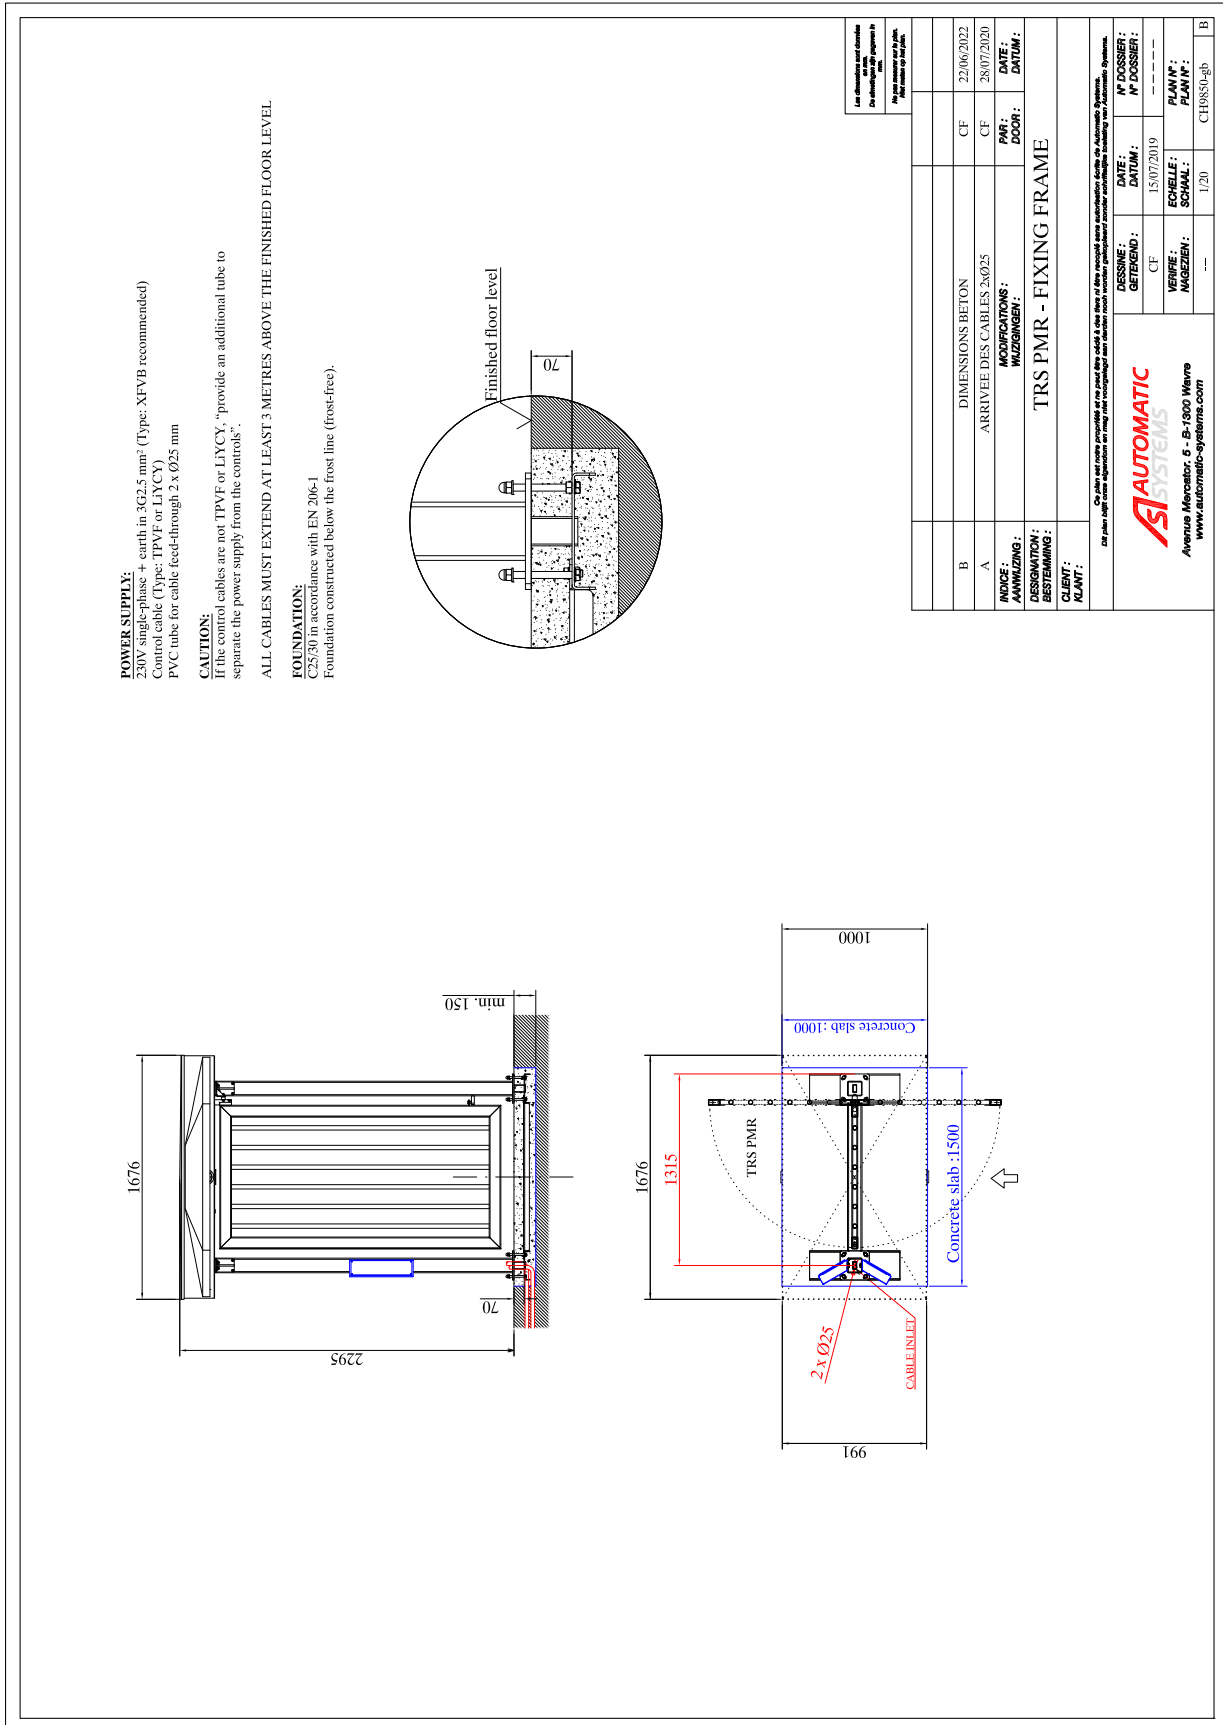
Installation Diagram - Mounting on a Fixing Frame
